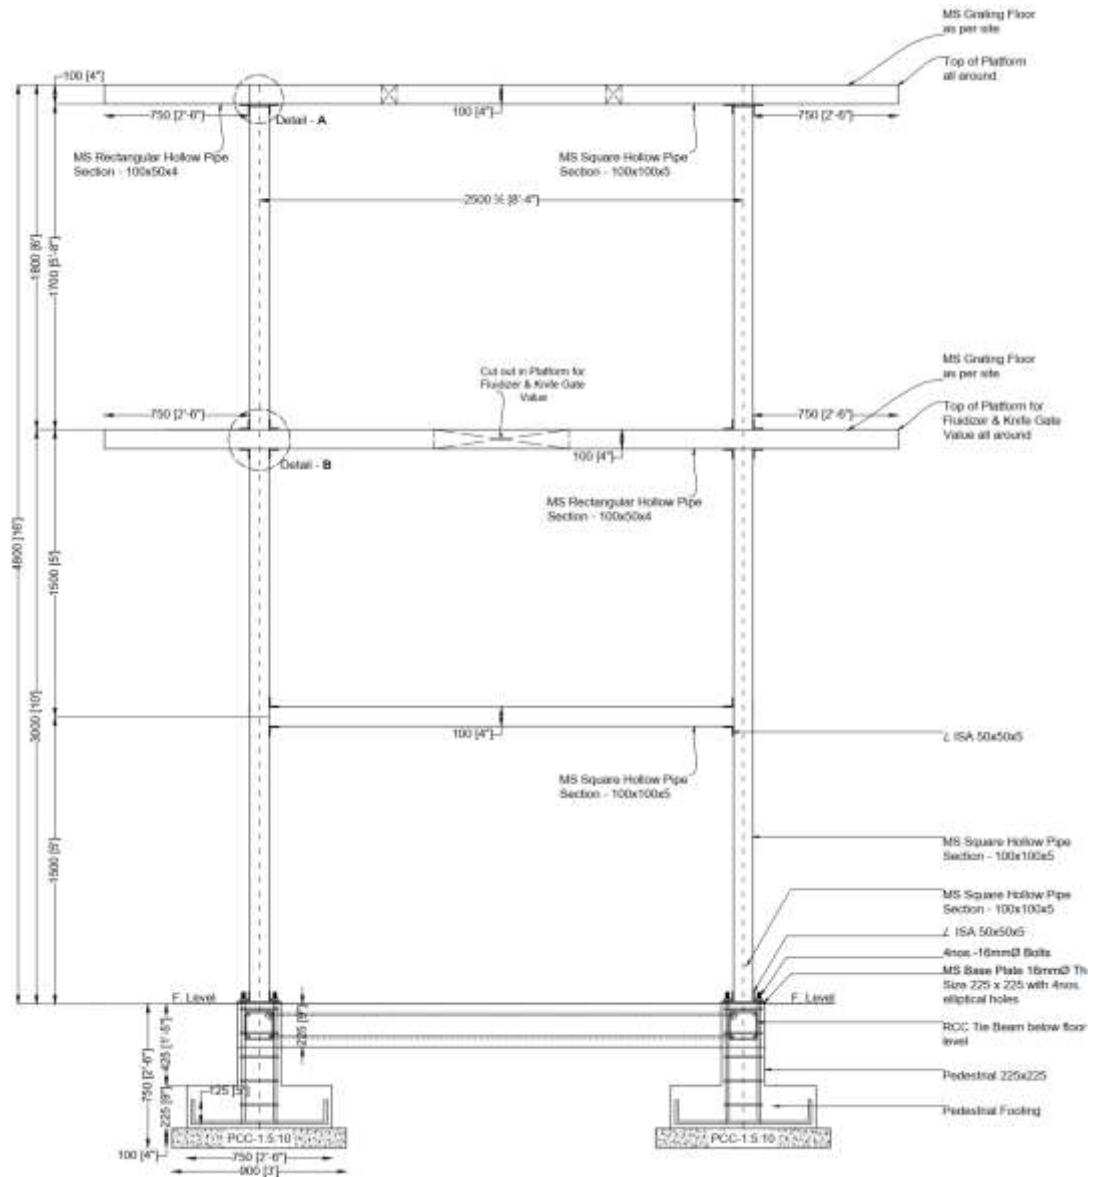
Elevation of the supporting structure for positive pressure system stacked-up assembly
